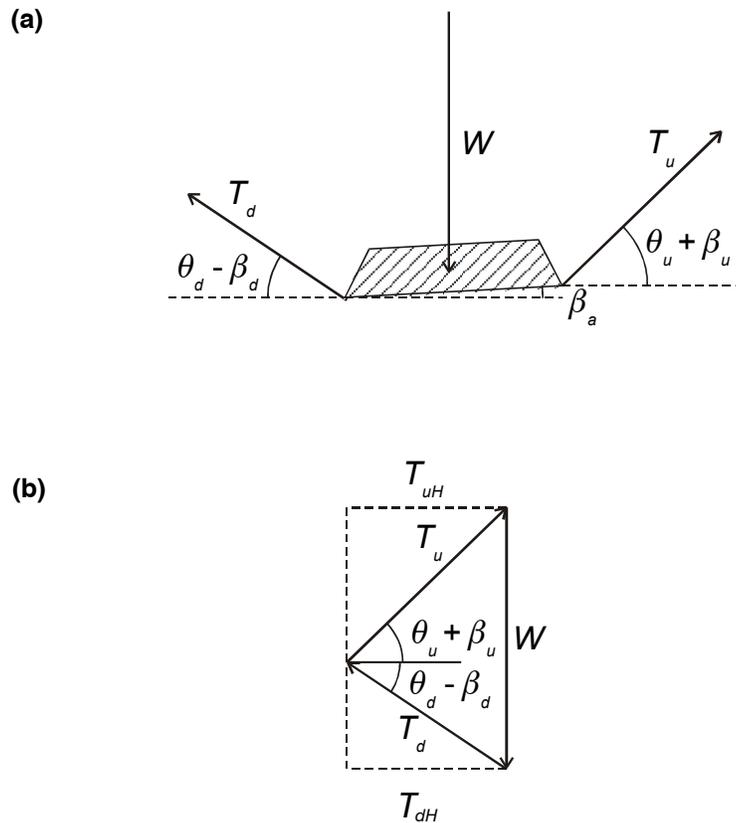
Case of anchor bench failure by uplifting: (a) forces acting on the anchor bench; (b) force diagram.
